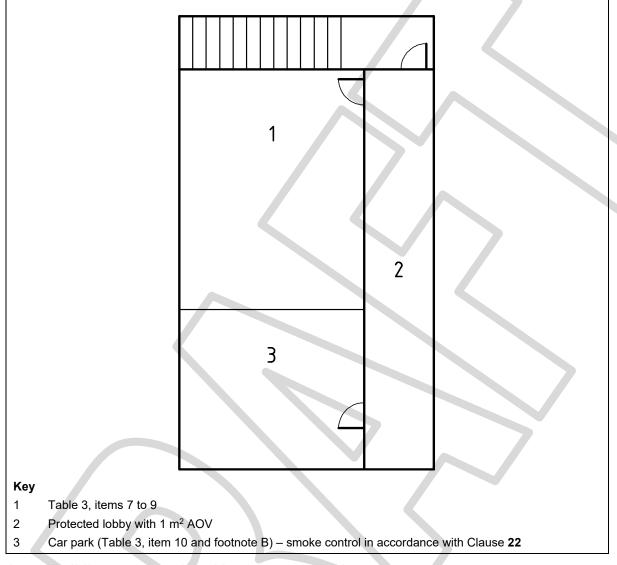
Basement lobby ventilation: Clarification of recommendations for single-stair buildings – Items 2 to 6 and footnote A
